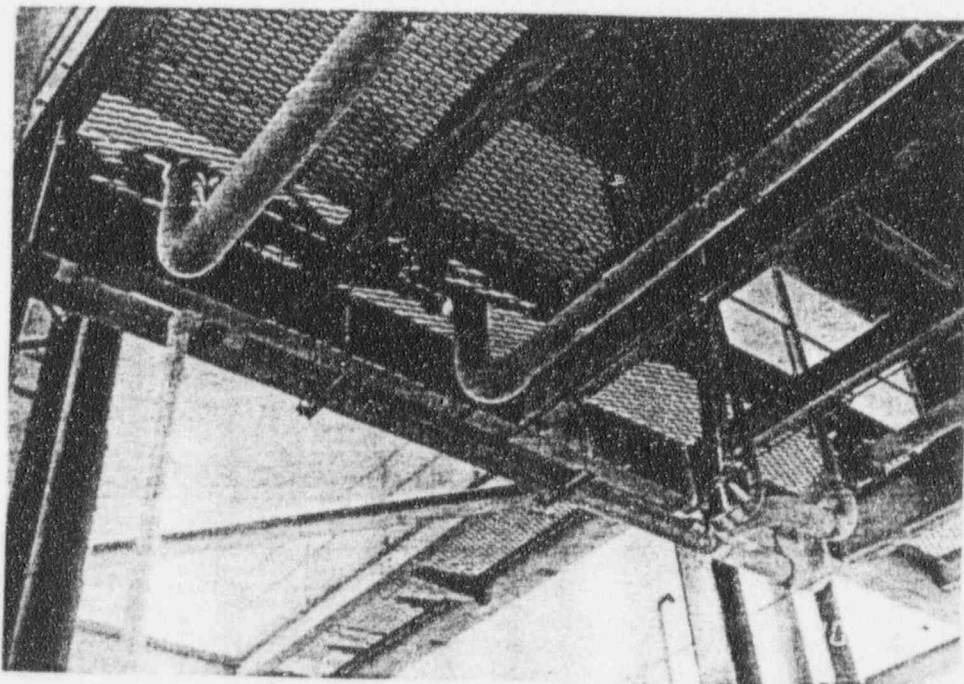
Typical piping and support configurations at Valley Steam Plant.
